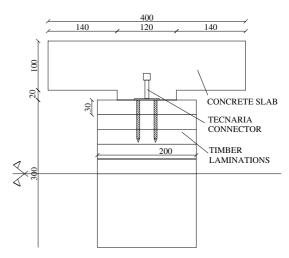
Half cross-section of the push-out specimens (dimensions in mm)
